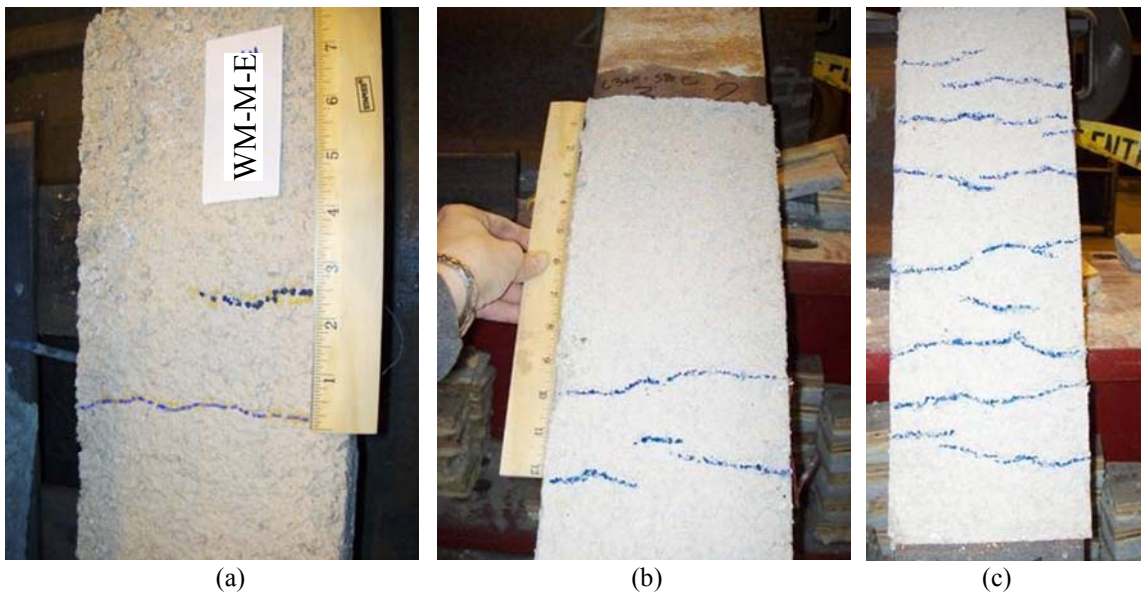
Cracking in WM specimens: (a) typical WM-M specimen with one major and one minor crack; (b) plate WM-SB-C with minor additional cracking; and (c) plate WM-SB-F with extensive additional cracking
